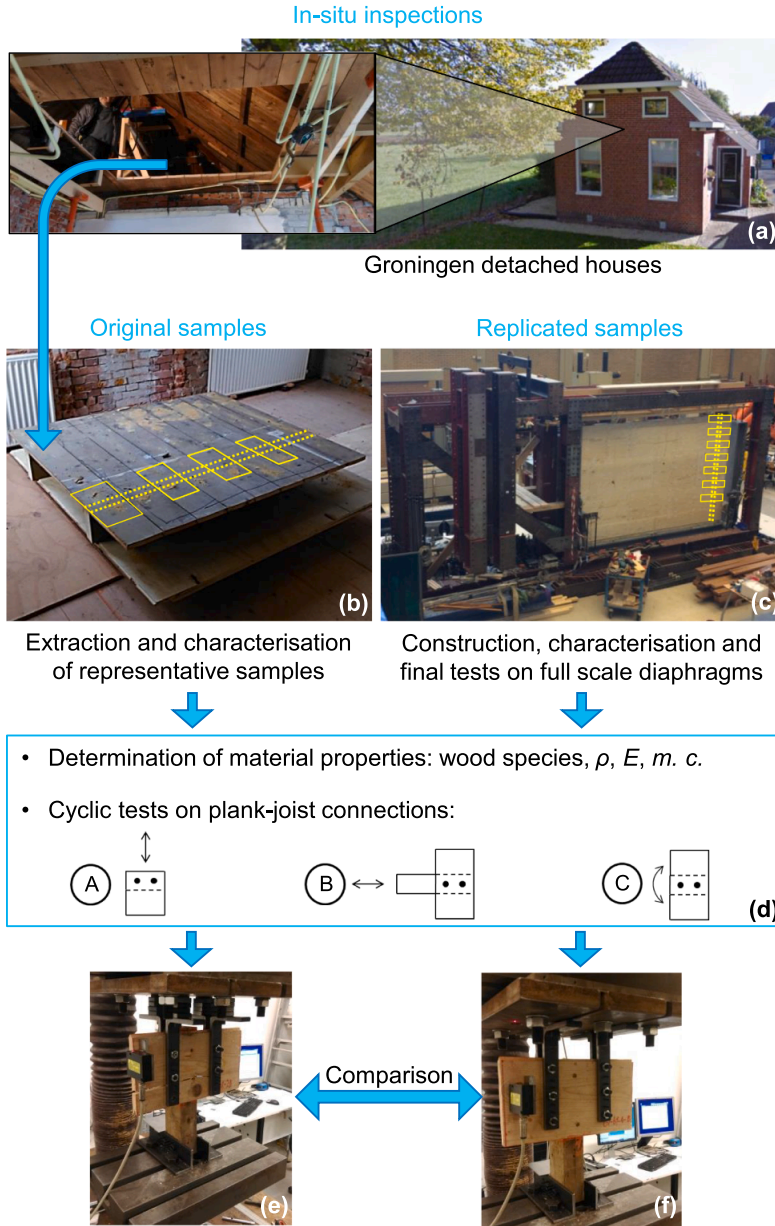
Process followed for the determination of material properties of timber and plank-joint connections for original and replicated samples: (a) in-situ investigation and selection of samples; (b) extraction of floor and roof samples; (c) construction of replicated specimens on the basis of the characteristics of original ones; (d) characterization of material properties and cyclic behaviour of plank-joint connections, with comparison between extracted (e) and replicated samples (f). From [132].
